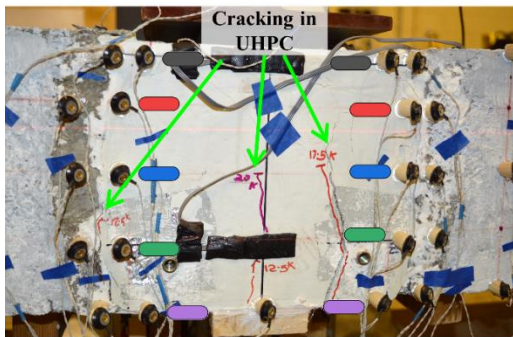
Measured LED joint opening and joint cracking of specimen Slab-DL-UH1
